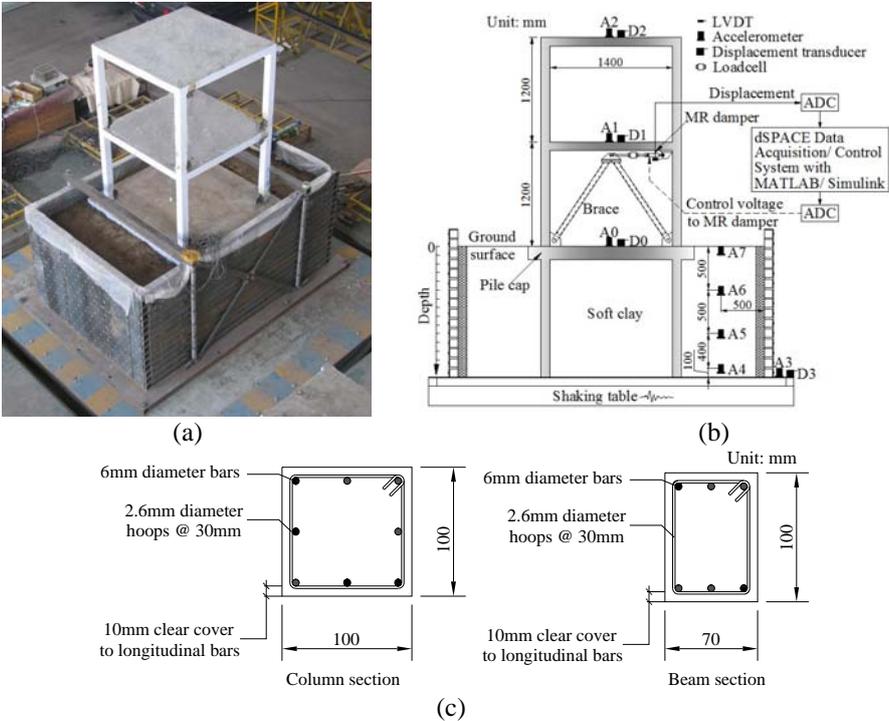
Photo of test setup on IEM shaking table and detailed design results of the frame: (a) top view, (b) schematic diagram of control test setup and (c) detailed design information.
